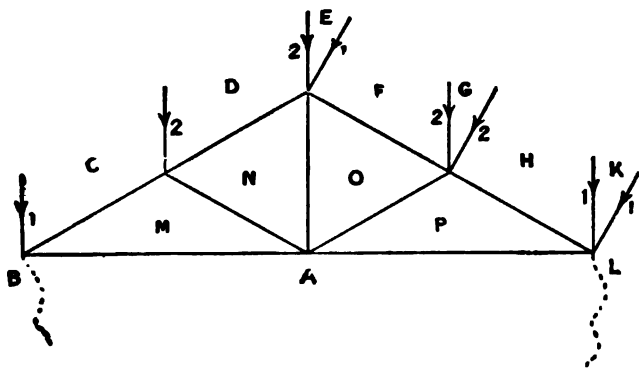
FRAME DIAGRAM OF KING POST TRUSS.
